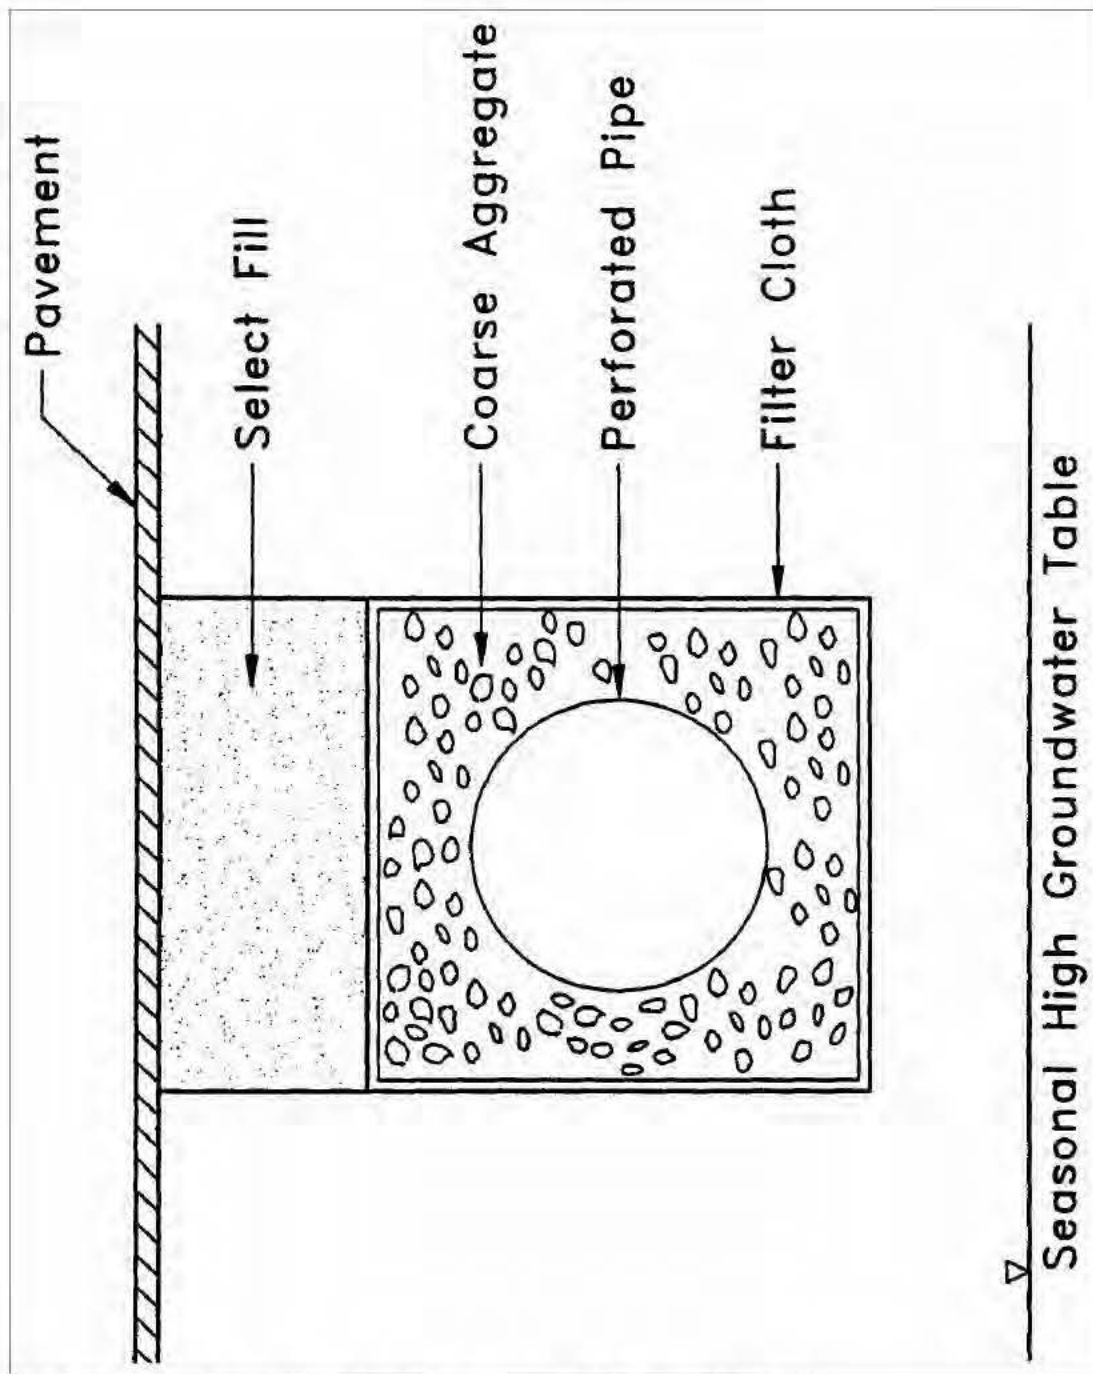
Cross-section of typical underground exfiltration trench (N.T.S.)
